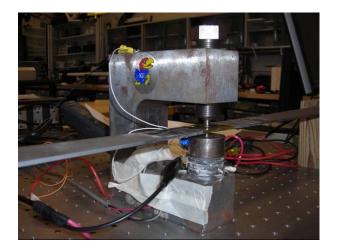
Photograph showing PICK too being used to treat a crack-stop hole is a steel fatigue specimen
